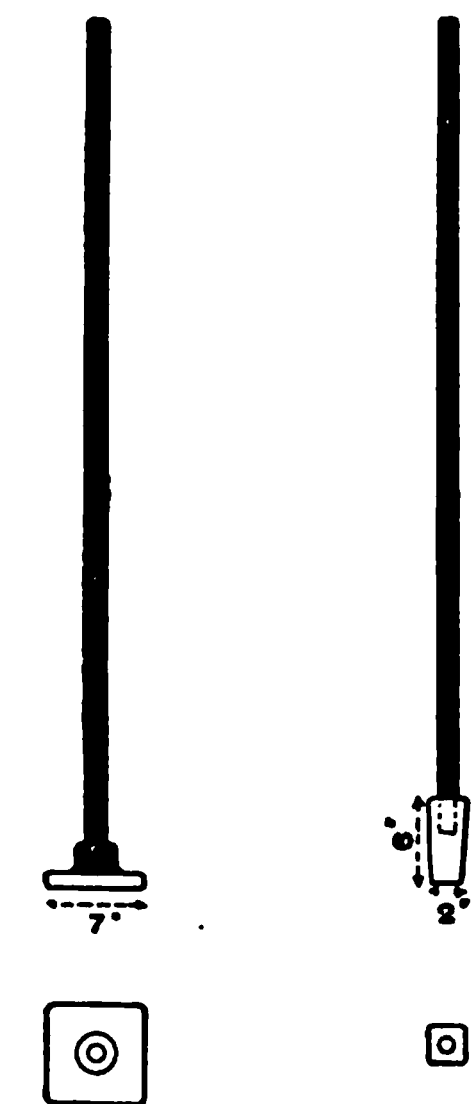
Rammers for Dry Concrete. (See p. 373.)
